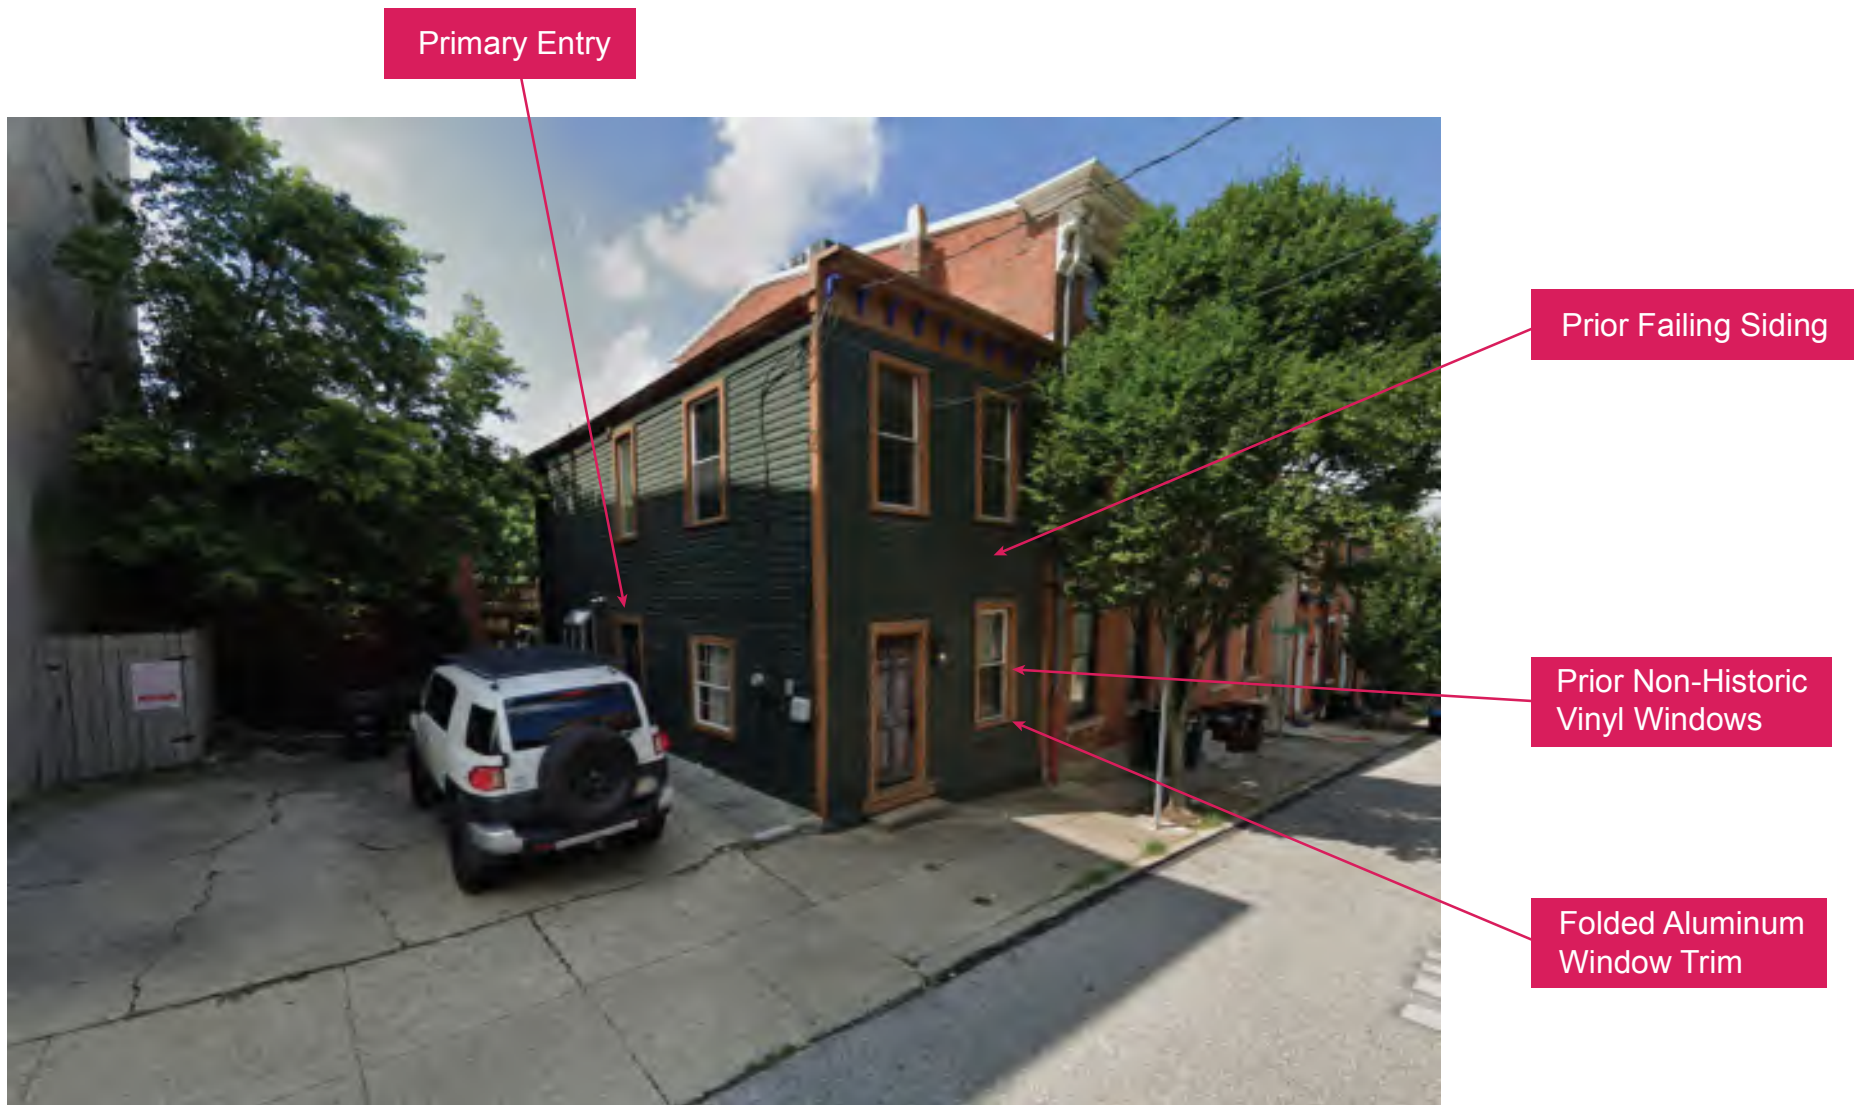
Previous Front and Side facade of 341 Milton St. 2022 Google Street Views
